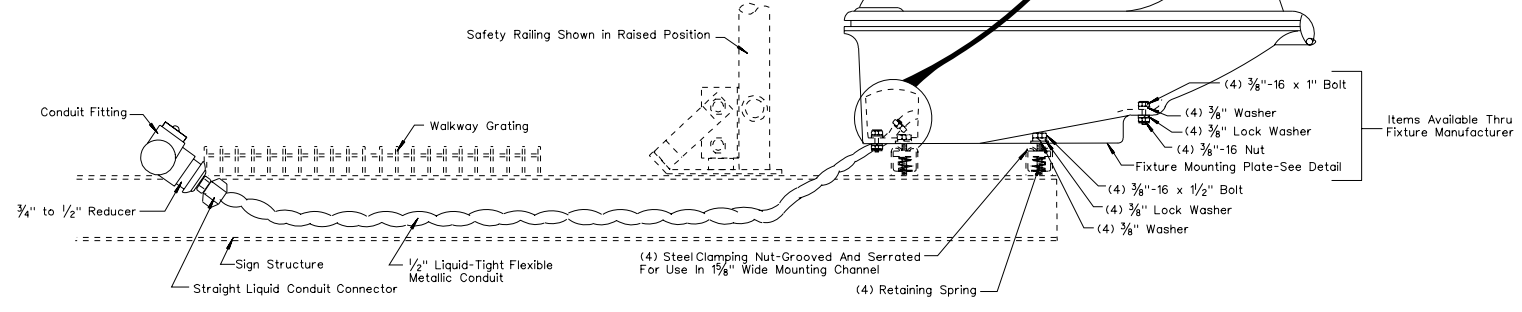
DETAIL LIGHTING FIXTURE MOUNTING PLATE
